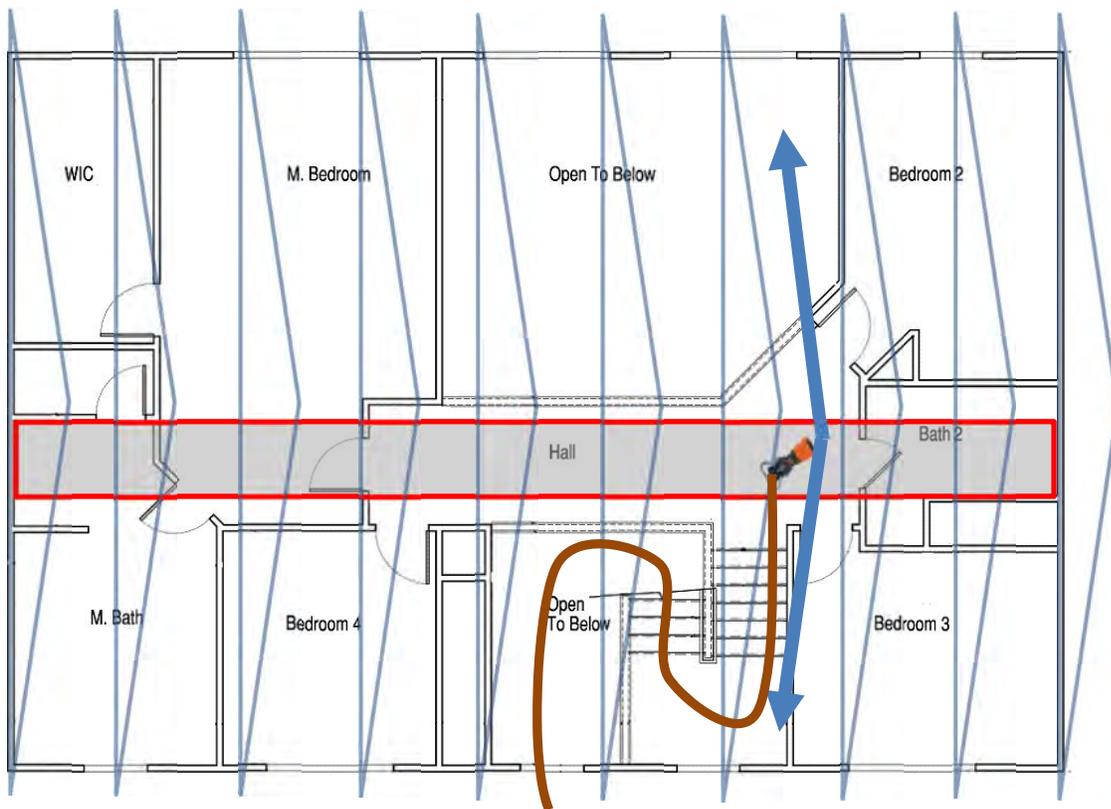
40: Floor plan of a 2-story house showing where to open drywall on a center hallway layout to effectively apply water to the sheathing by flowing down each rafter bay toward the front and rear of house.
